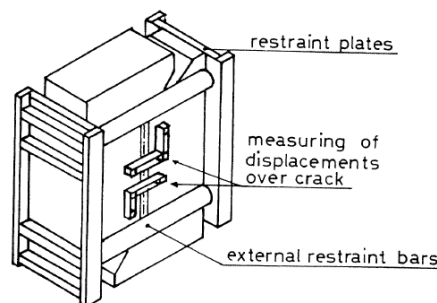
Arrangement of external reinforcement (Walraven & Reinhardt, 1981)
